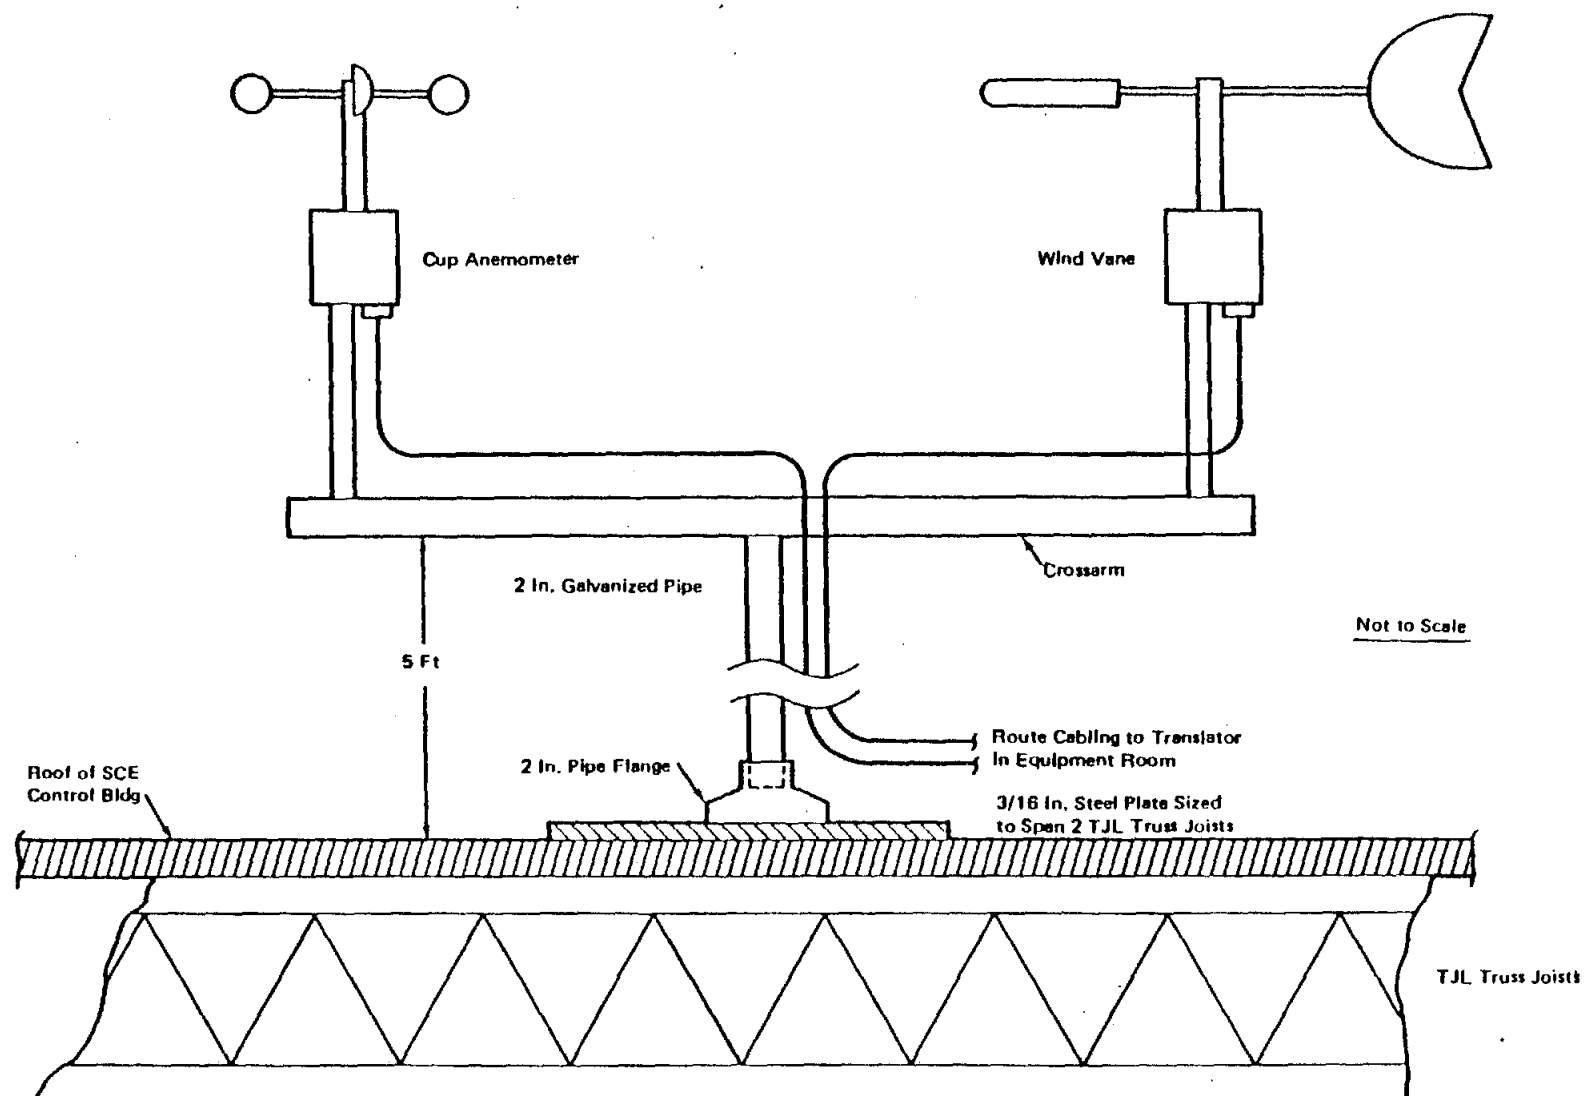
WIND SENSOR DESIGN - CONTROL ROOM ROOF
